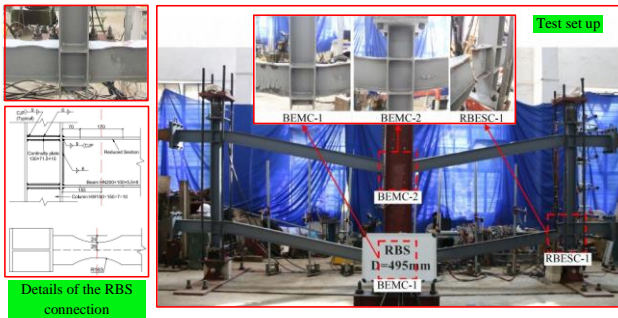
Collapse test of two-story steel frame with RBS connection [25] (dimension units: mm)
